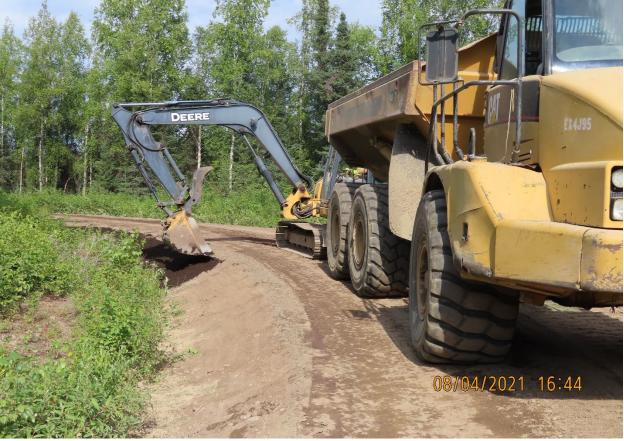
Constructed road embankment section along Willer-Kash Road, with established ditches, fill slopes, and drainage transitions into existing adjacent vegetation.
